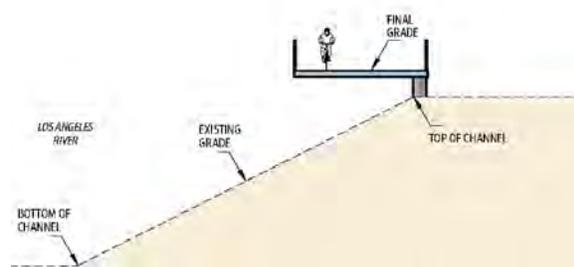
Example Cross Section of a Cantilevered Top-of-bank Path Type
